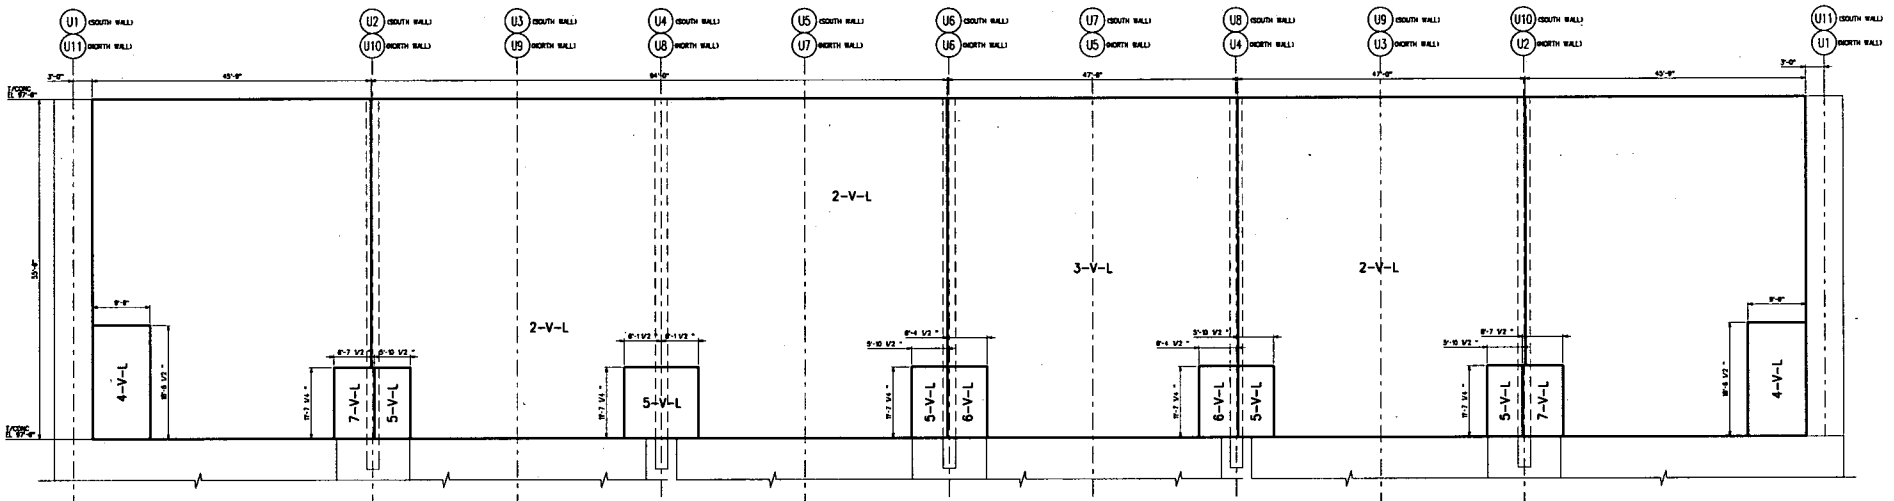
H.6-109: FAN NORTH (AND SOUTH) WALL LOOKING SOUTH (NORTH)
